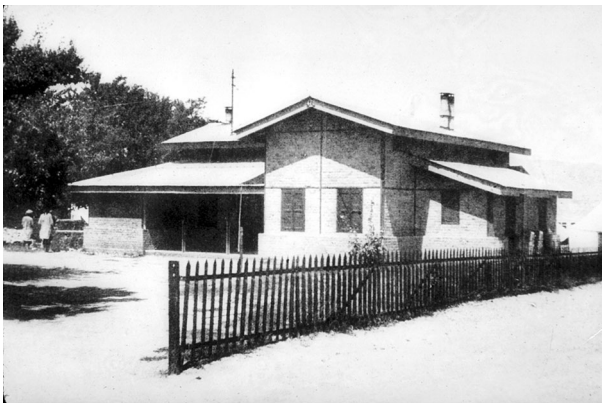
A railway bungalow built after 1931 earthquake of vertical and horizontal iron rails with brick panels. The few buildings of this type (including one under construction) escaped damage in 1935, though surrounding buildings of unreinforced brick were destroyed (photo: W. D. West, source: NISEE–PEER University of California Berkeley)
